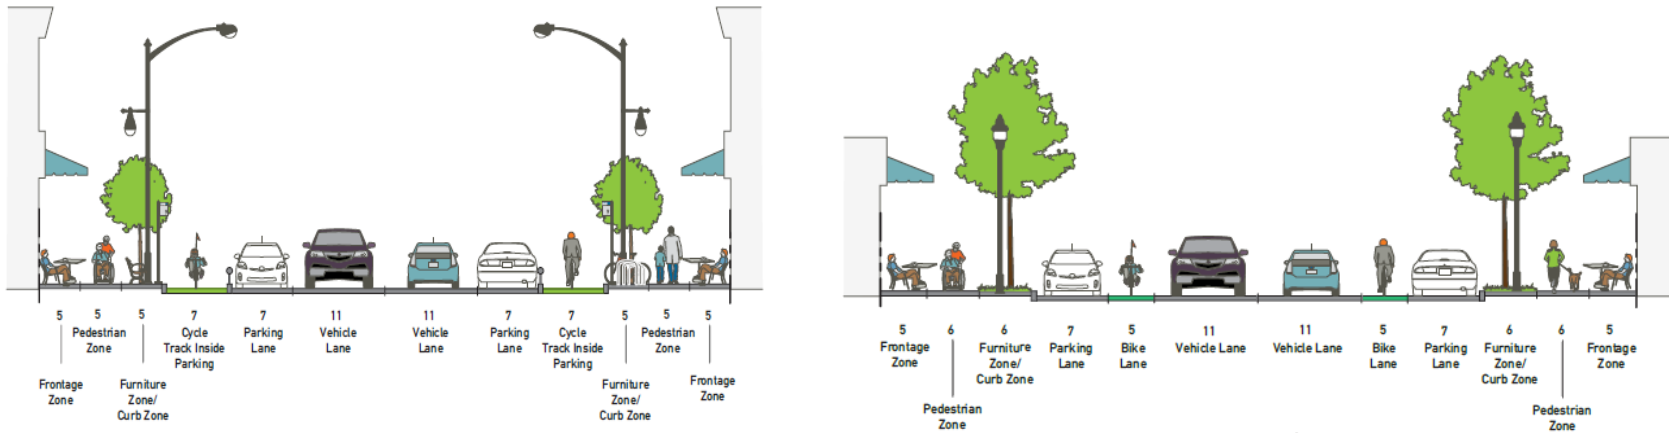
B Possible Cross Sections for Prides Corner Roads and Streets
